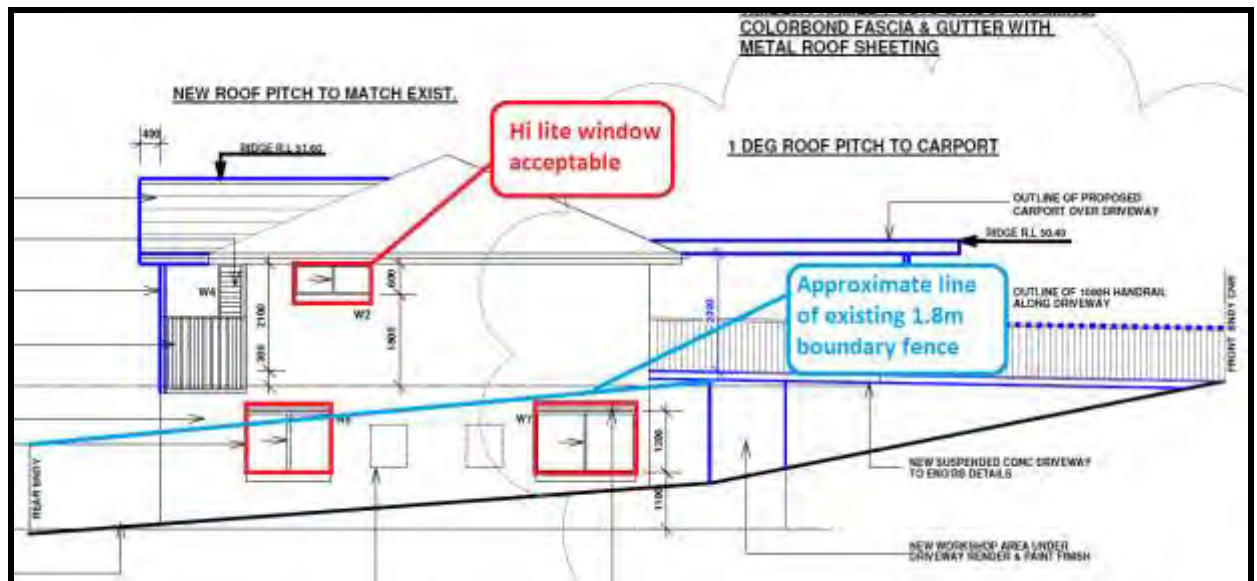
Northern elevation windows with indicative location of existing 1.8m boundary fence considered acceptable for maintaining visual privacy from the ground floor windows.
